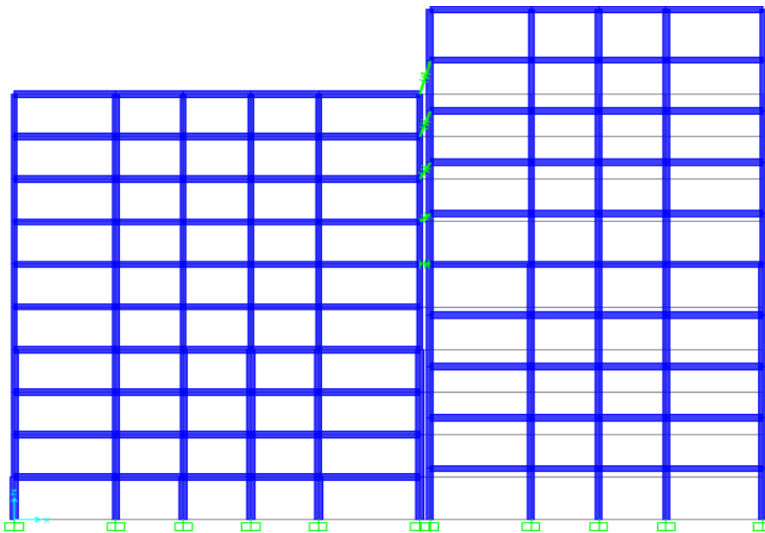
Elevation of structure, 3 m (left) and 3.2 m (Right) with FVD.
